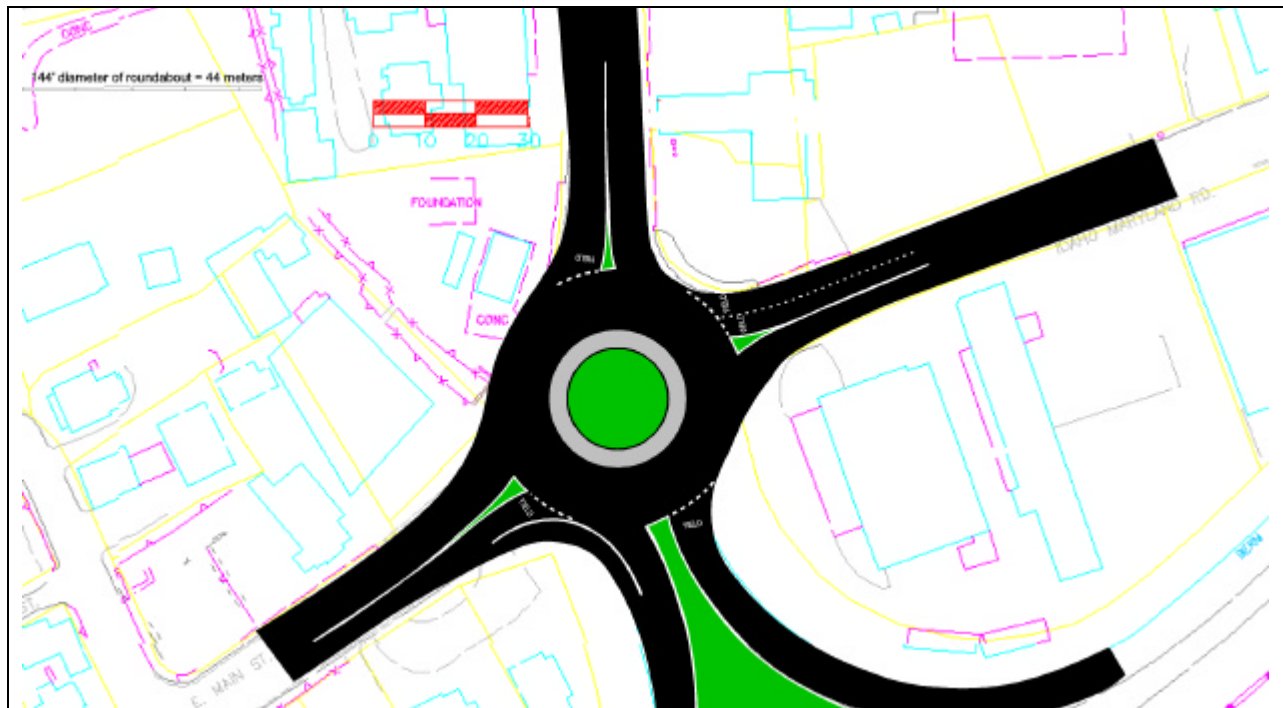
Proposed Modern Roundabout with SBR Bypass
